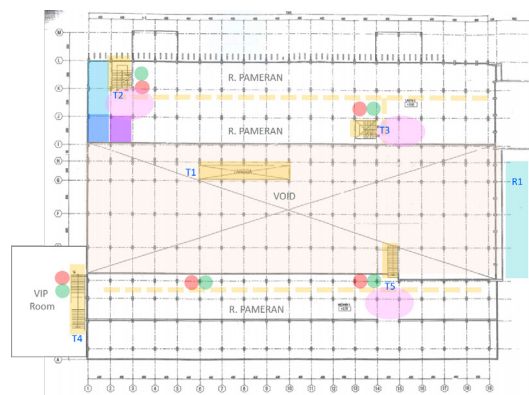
Layout and circulation of exhibition hall, 2st floor and mezanin-1
